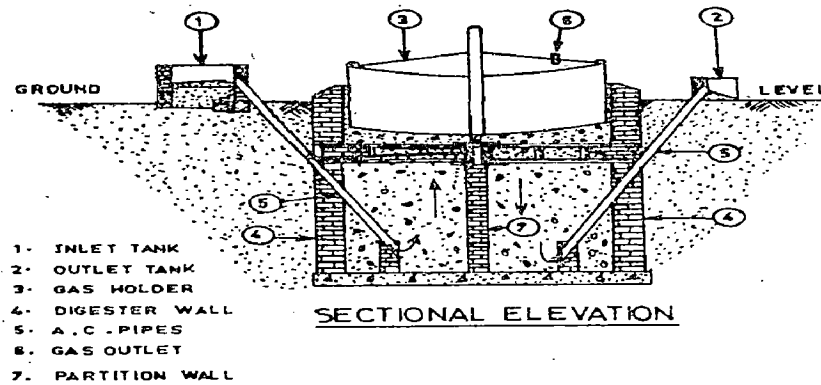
A Typical Moving Dome Type Biogas Plant [35]
